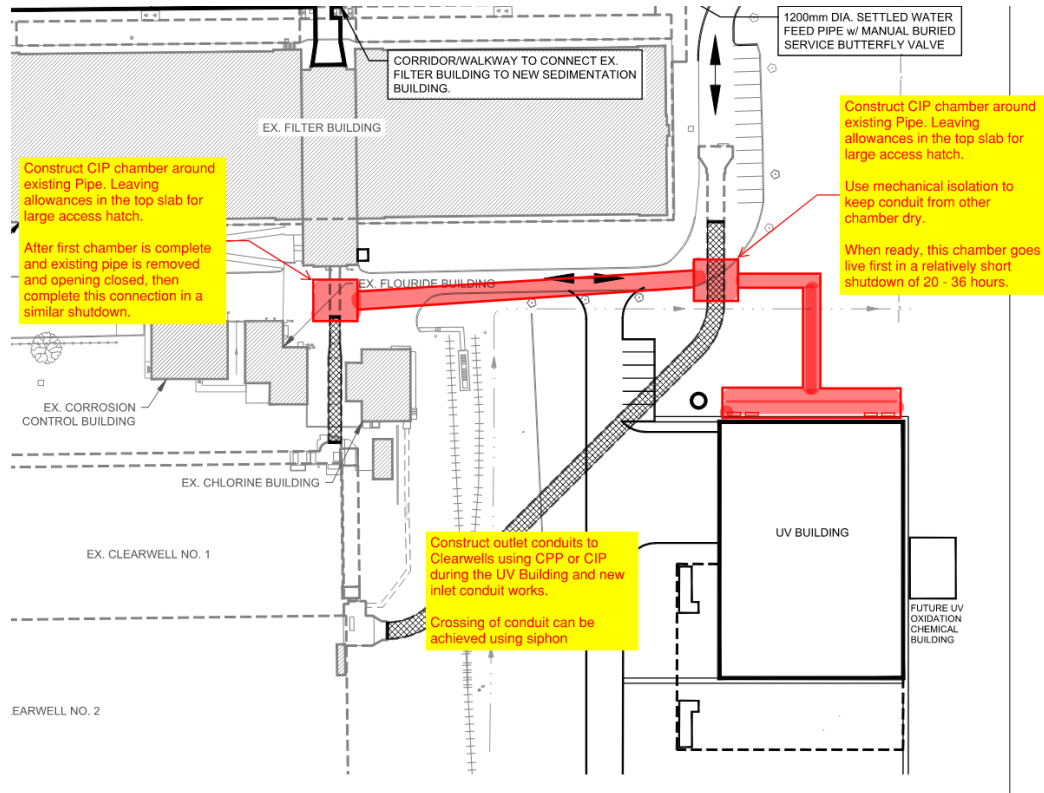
Alternative Conduit Connections (Drawing Source: AECOM Conceptual Design, 2021)
